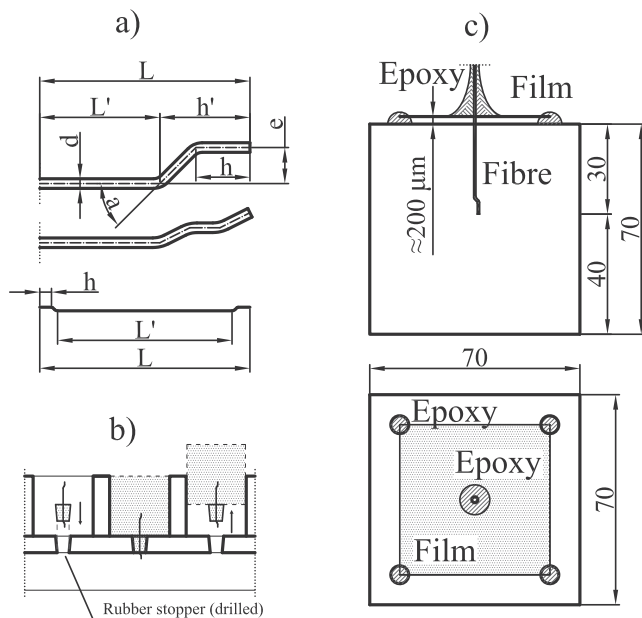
Dimensions of specimens: a) fibre dimensions, b) formwork and fibre placement, c) pull-out specimen. Dimensions are expressed in mm.
